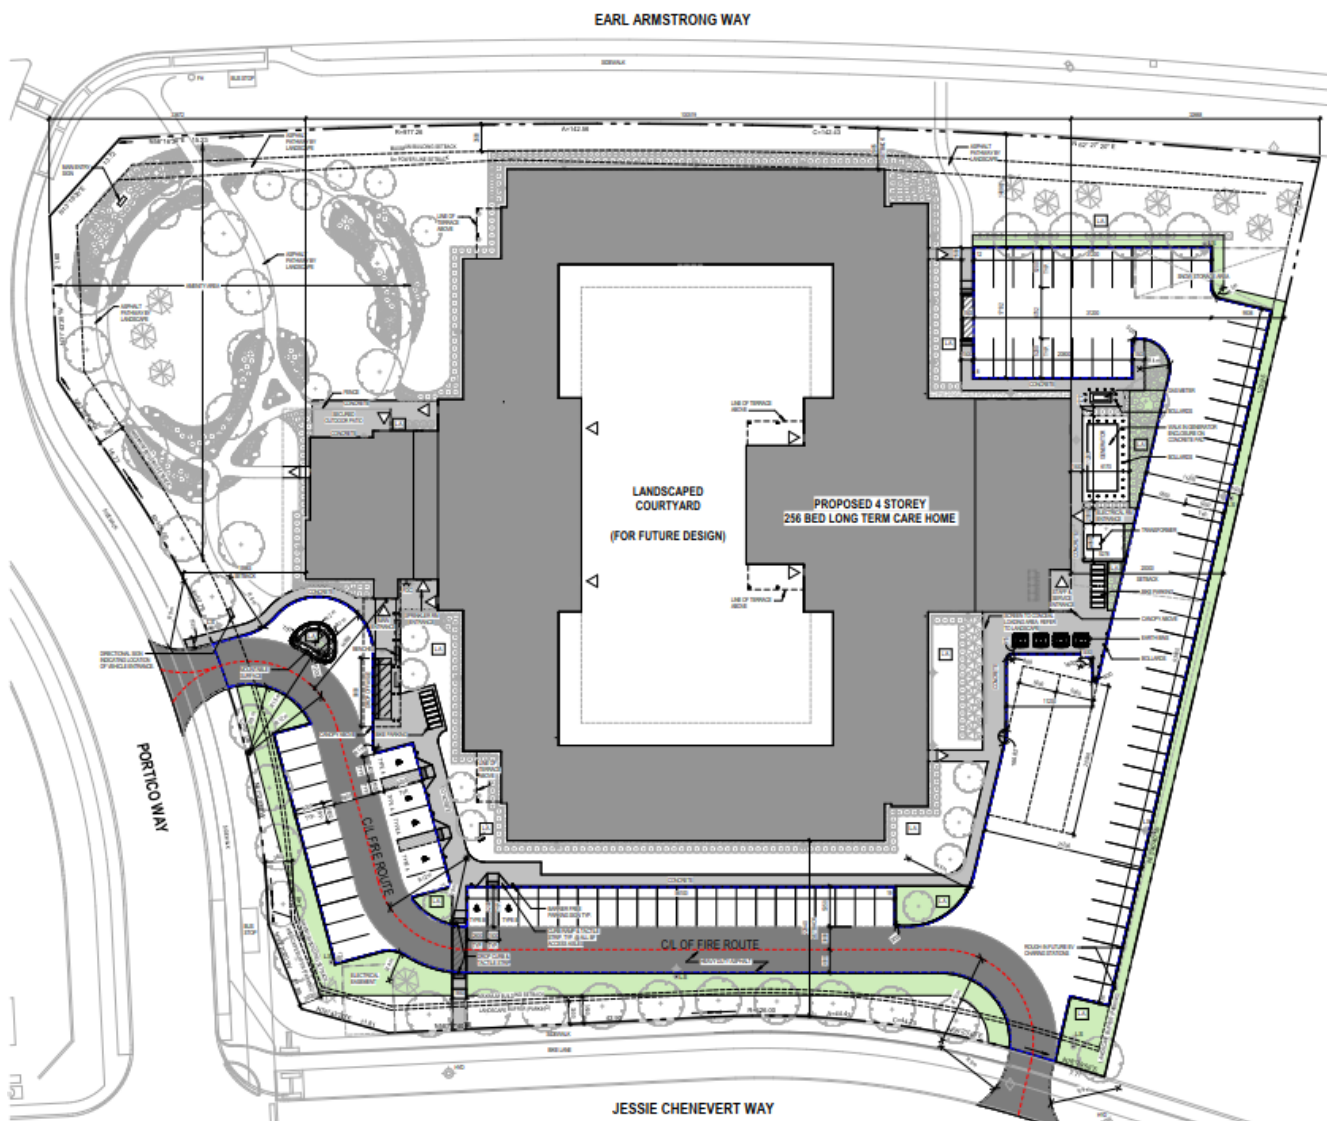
Proposed Site Plan, prepared by Montgomery Sisam Architects Inc.
